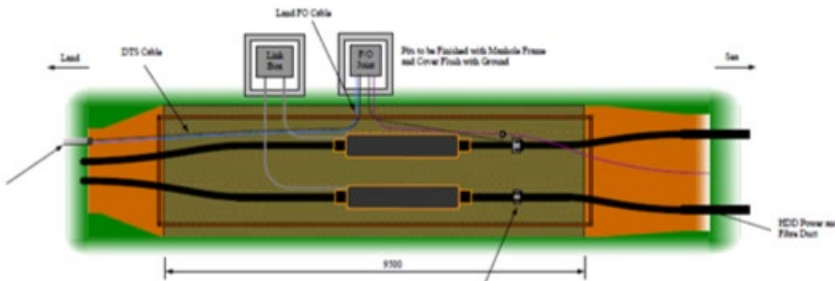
Typical transition joint bay lay-out for HVDC cable system comprising of 2 DC cables and a Fibre Optic (without MR cable)
